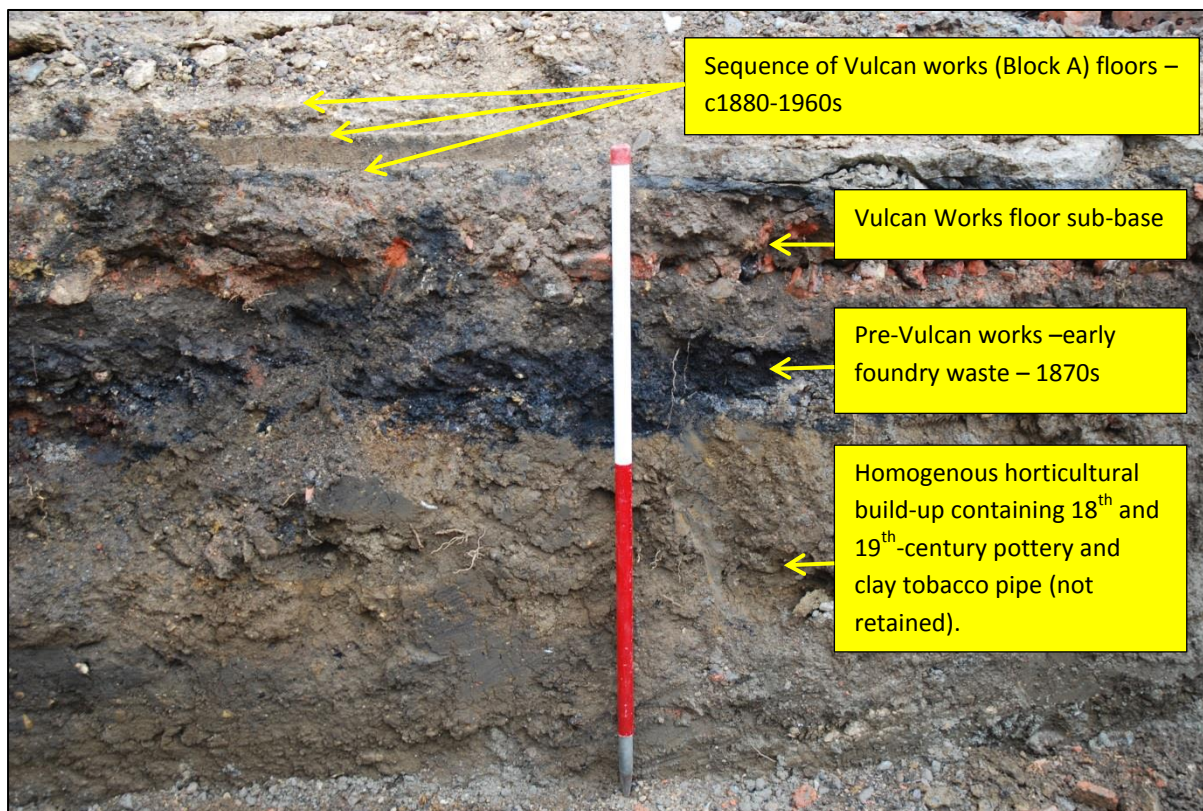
North facing section under the floor of Block A, along bays 7-9 of the Vulcan Works (its north wall removed). The Vulcan Works Block A floors are marked. In excess of 1m of post-medieval fill lies below them.
